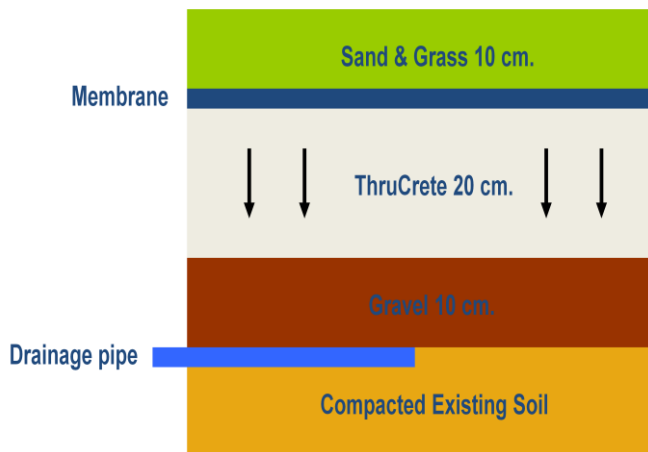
Typical cross section of pervious concrete with drainage pipes which can be used for grounds
